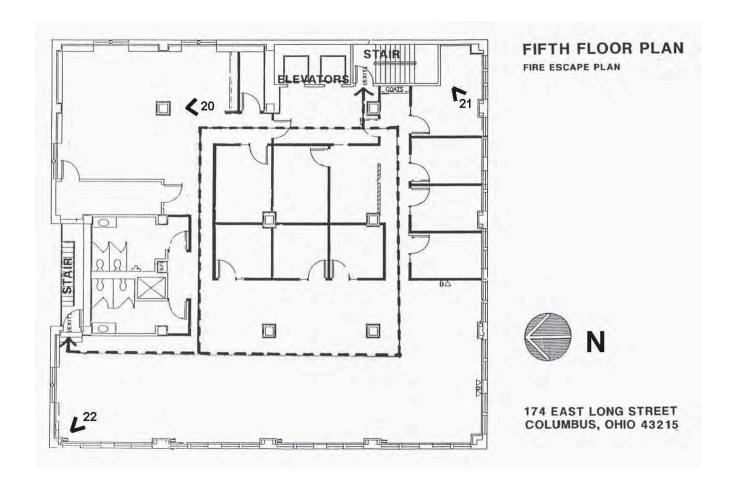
The Standard Building Floor Plan/Photo Key – Fifth Floor
